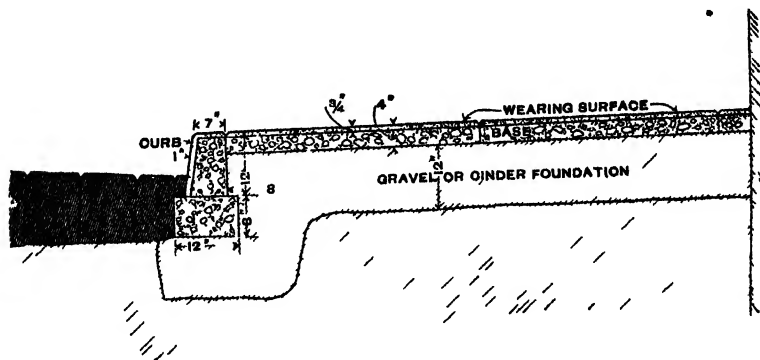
Typical Concrete Sidewalk and Curb (See p. 602)
